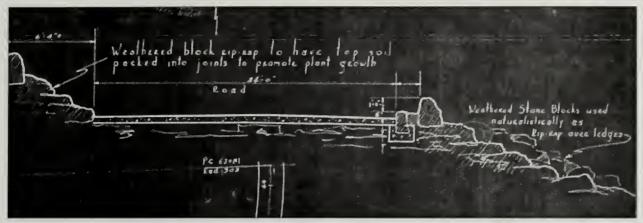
Detail of hand-laid rock embankments at the parking lot at the terminus of Schoodic Point Road, 1933. (U.S. Department of Agriculture, Bureau of Public Roads, Project 2A2, Sheet 1 of 1, 1933-1934)
